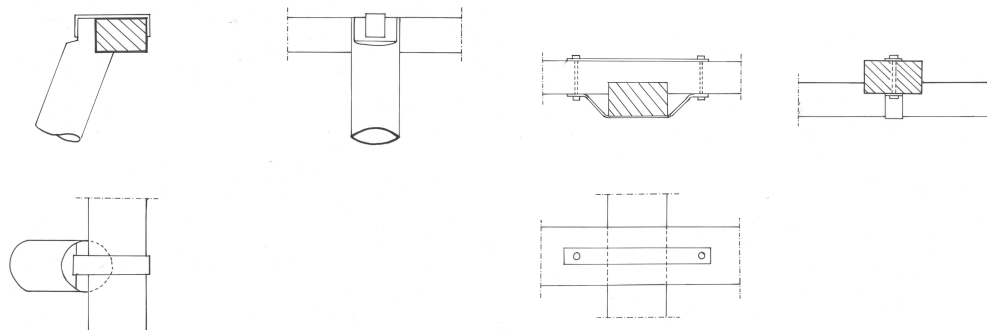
Connection type: Raking pile connection in wall section 4-1 (left), transverse beam to capping beam (right). The transverse beam is on top. Again, the floor planks are absent in this drawing.
